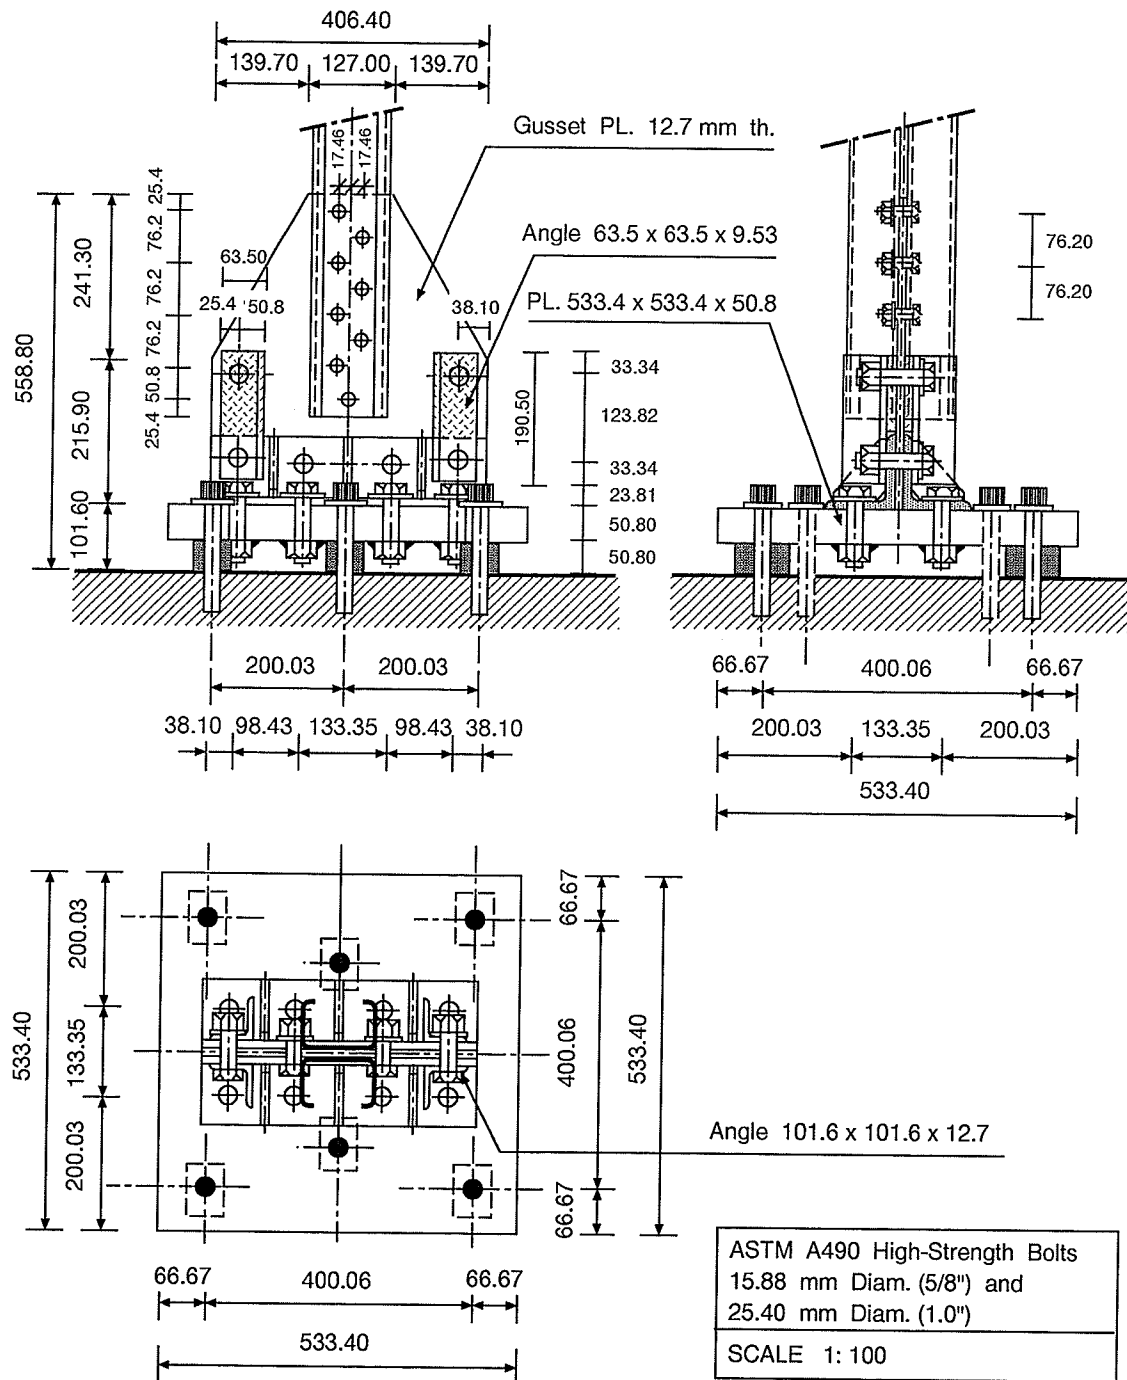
Connection Type "G - Bottom " Used with Test Setup # 2.
